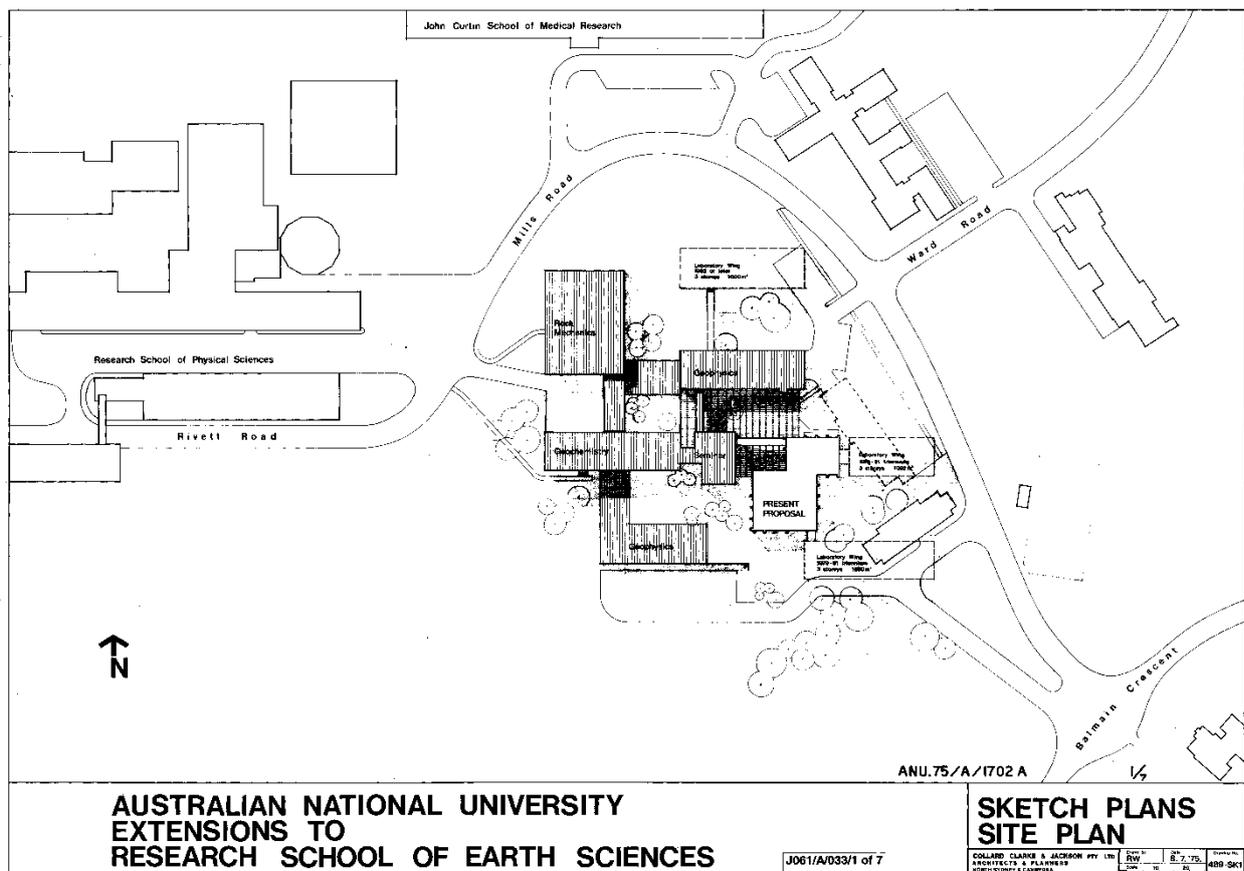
1975 Layout of the Jaeger complex with proposed building by Collard Clarke and Jackson Pty Ltd.
